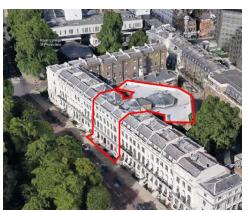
(left): Site location plan showing nos. 17, 18 and 19 Park Square East. Nos. 17 and 19 are former Nash townhouses fronting Park Square East only, while no. 18 fronts this street as well as Peto Place to the rear.
